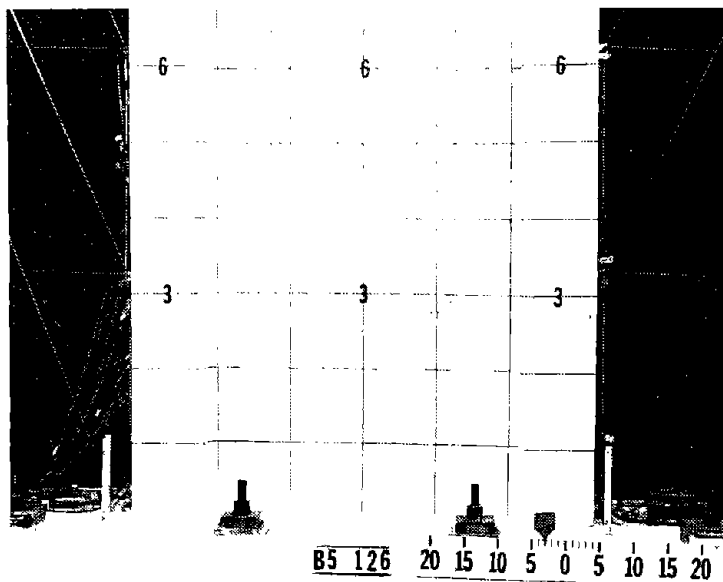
Cracking Pattern at -3 in. Deflection for Specimen B5
